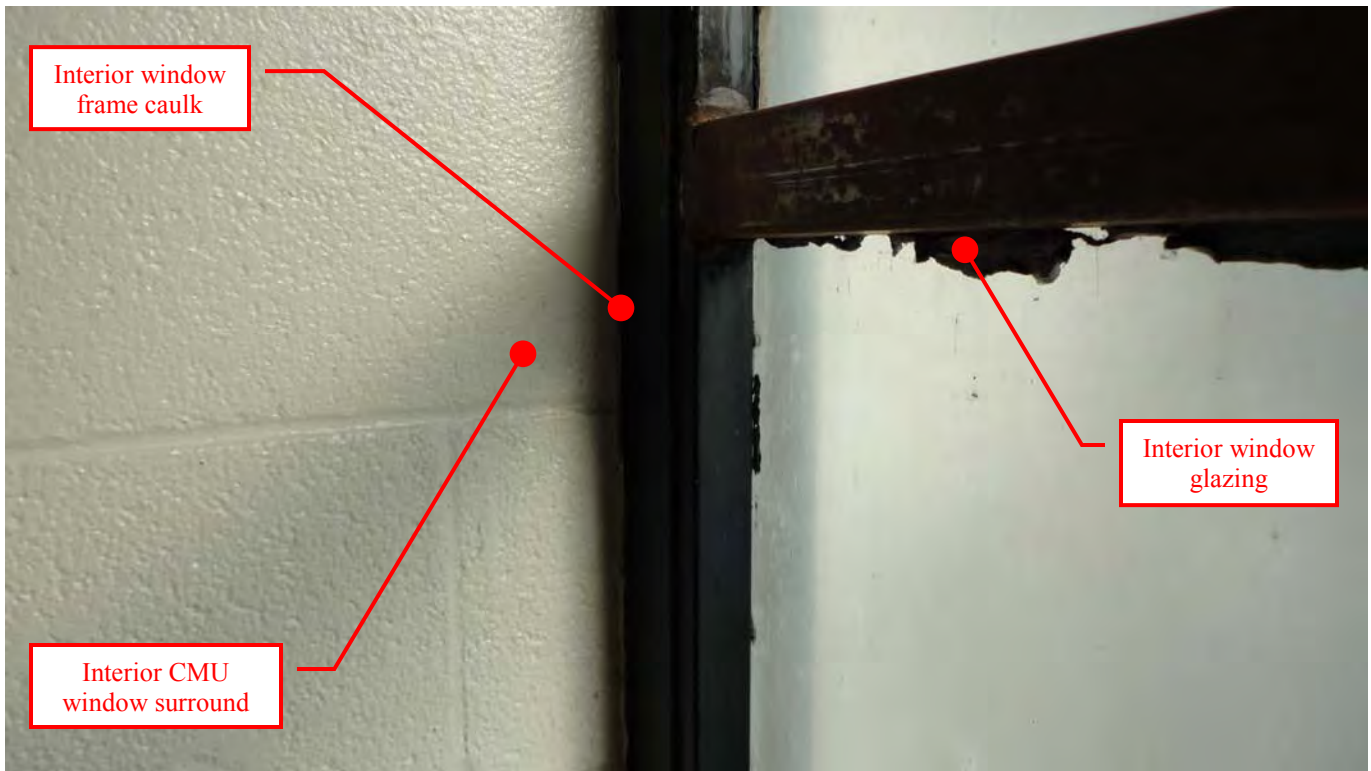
Typical classroom window frame caulk (vertical joint); painted, rubber window sealant (horizontal joint) and metal sill.
